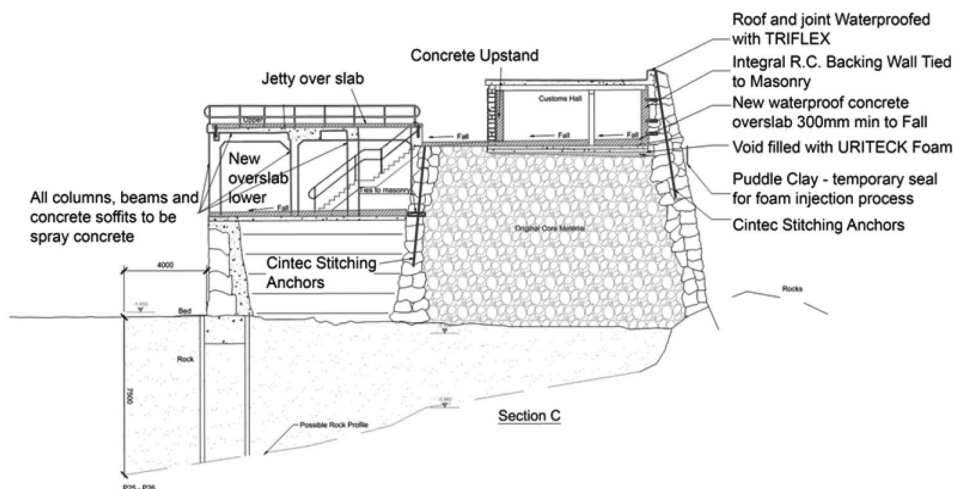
Scheme design remedial works – sheet piles, ring beam, deck over slab etc.
